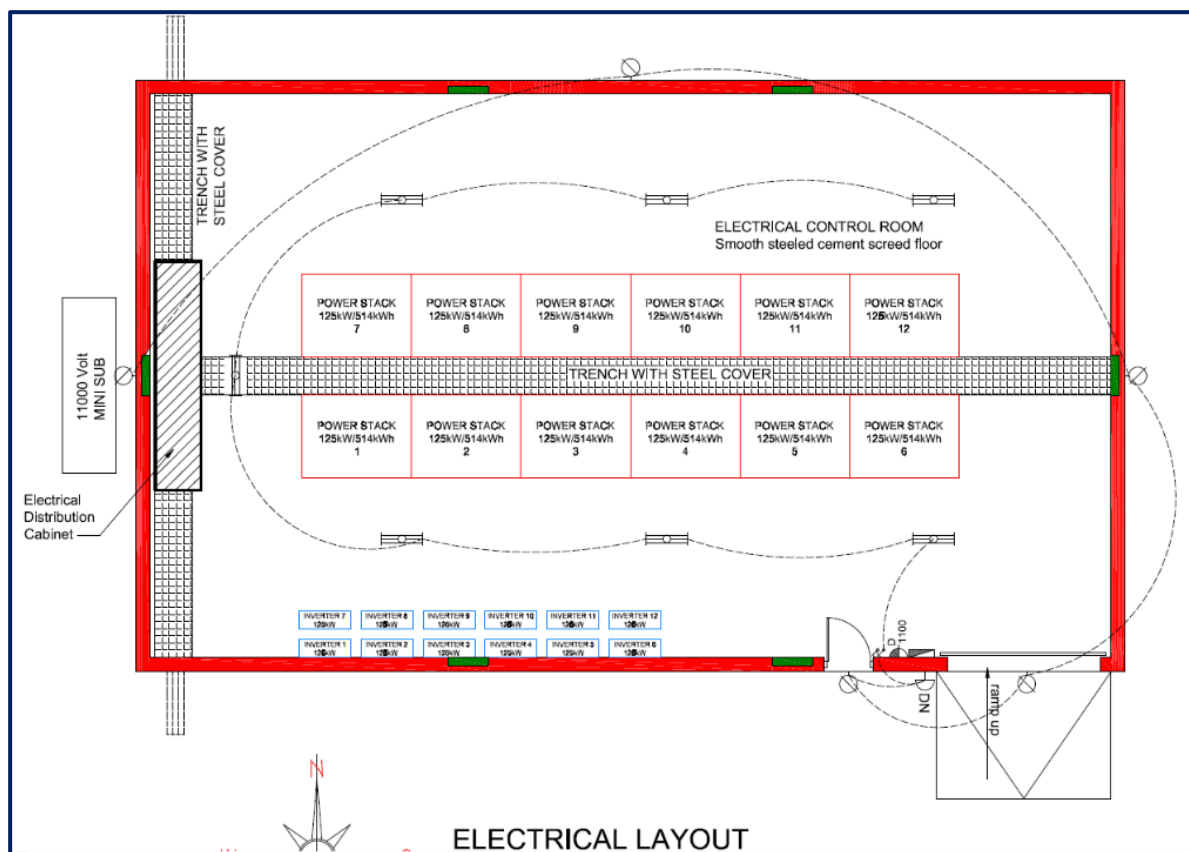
Electrical layout showing 12 solar structures and 12 inverters and 11KV mini sub
